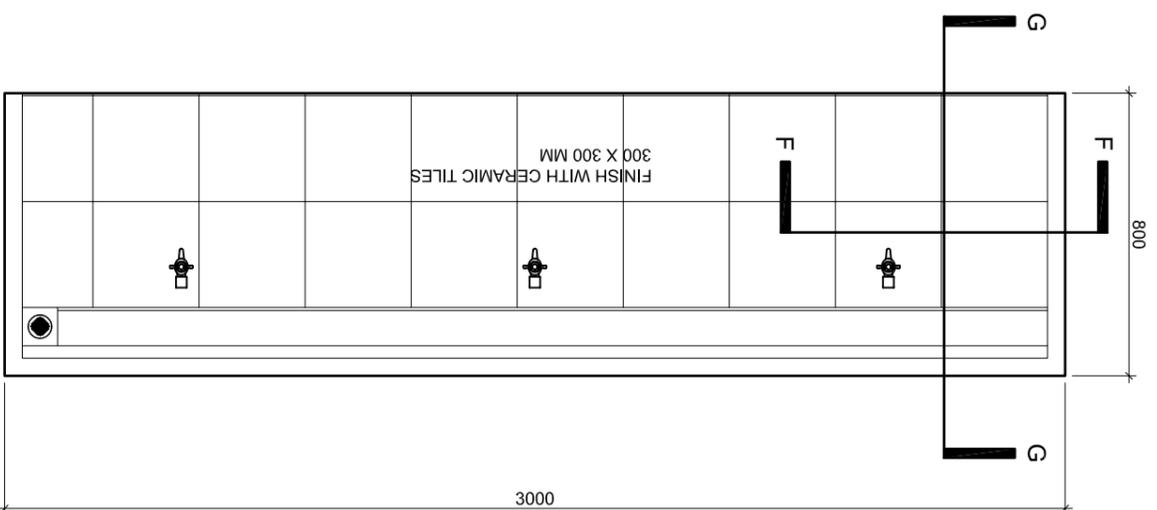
DETAILED PLUMBING LAYOUT OF KITCHEN
